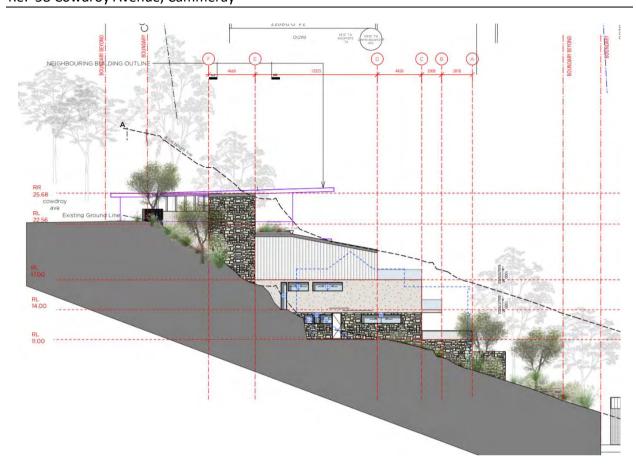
East elevation of the proposed development which shows the outline of the existing dwelling at No.58 Cowdroy (dashed blue), the profile of the proposed dwelling at No.58 and the pre-DA153/19 outline of No.56 Cowdroy (purple)
